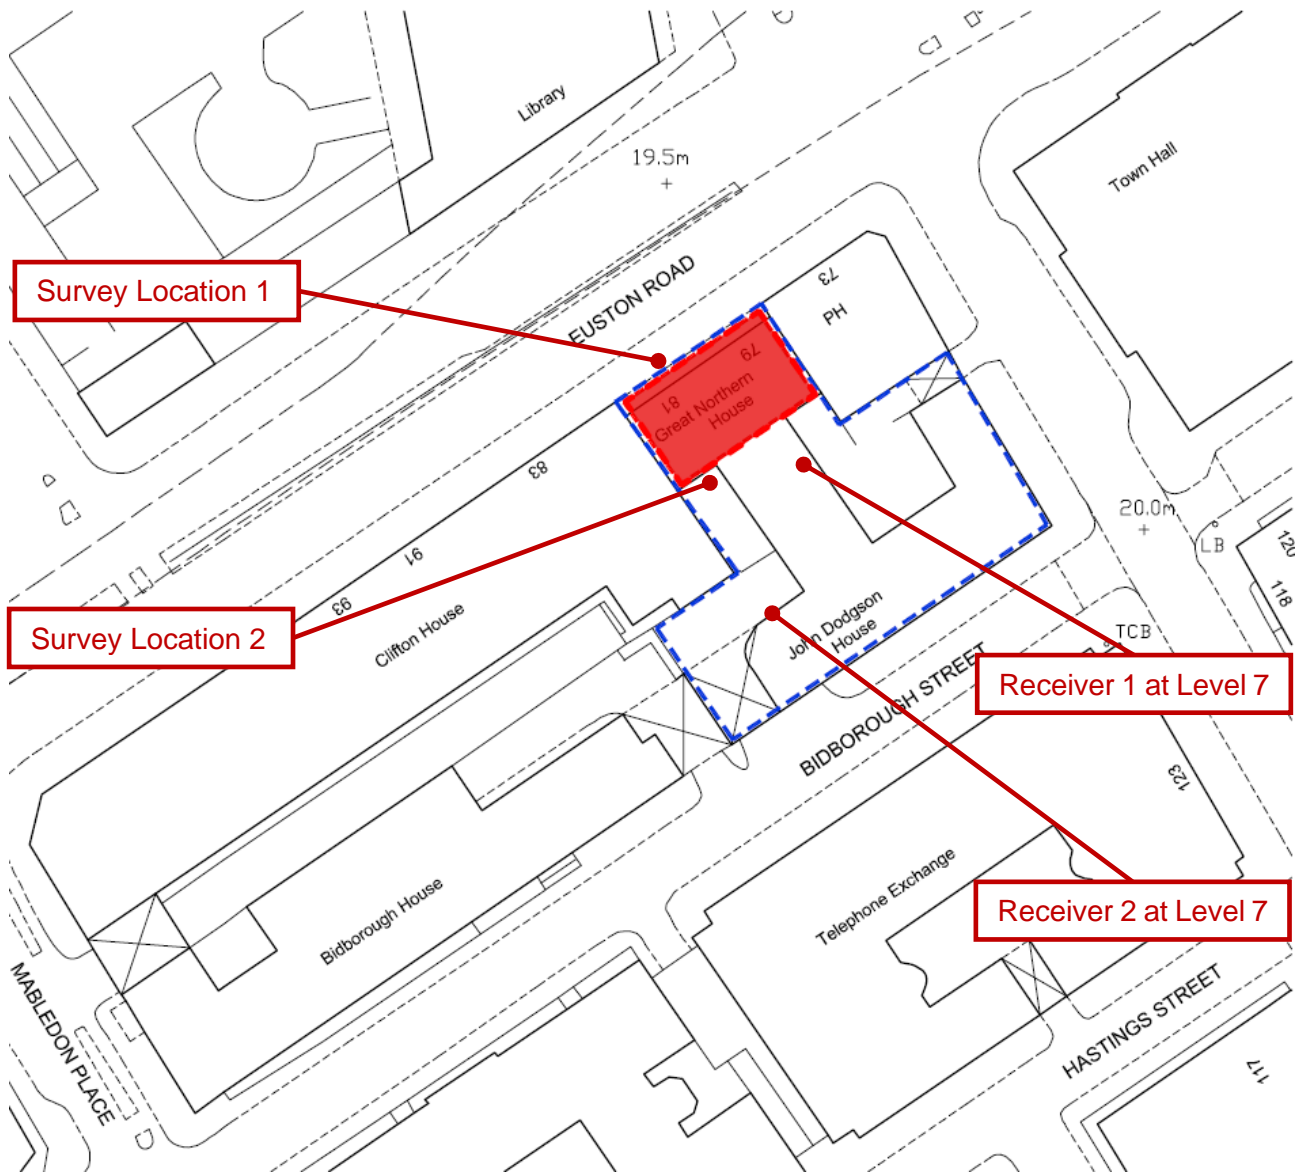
PROPOSED SITE LOCATION PLAN INDICATING KEY LOCATIONS (NOT TO SCALE)
